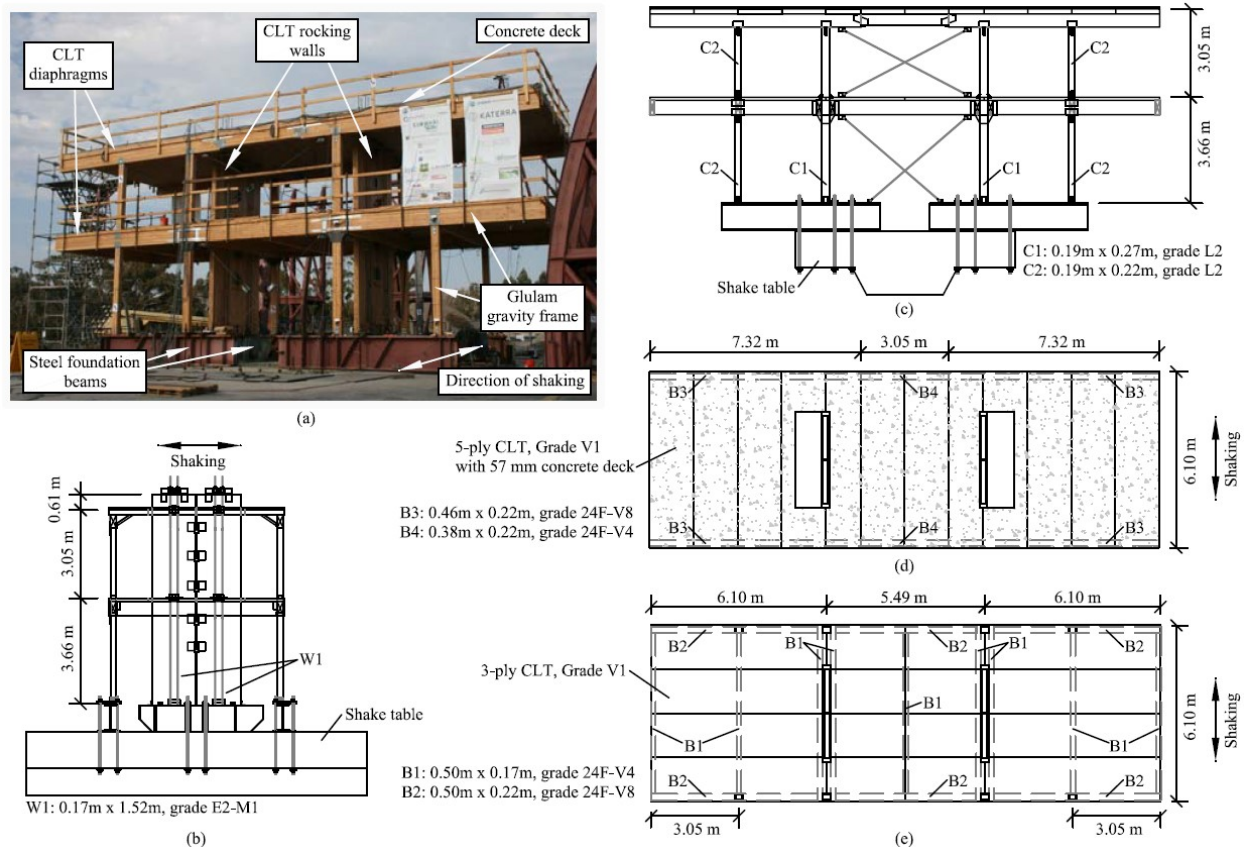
Two-story test building: (a) photo, (b) CLT rocking wall elevation view, (c) Building elevation view, (d) roof plan view, and (e) floor plan view.
